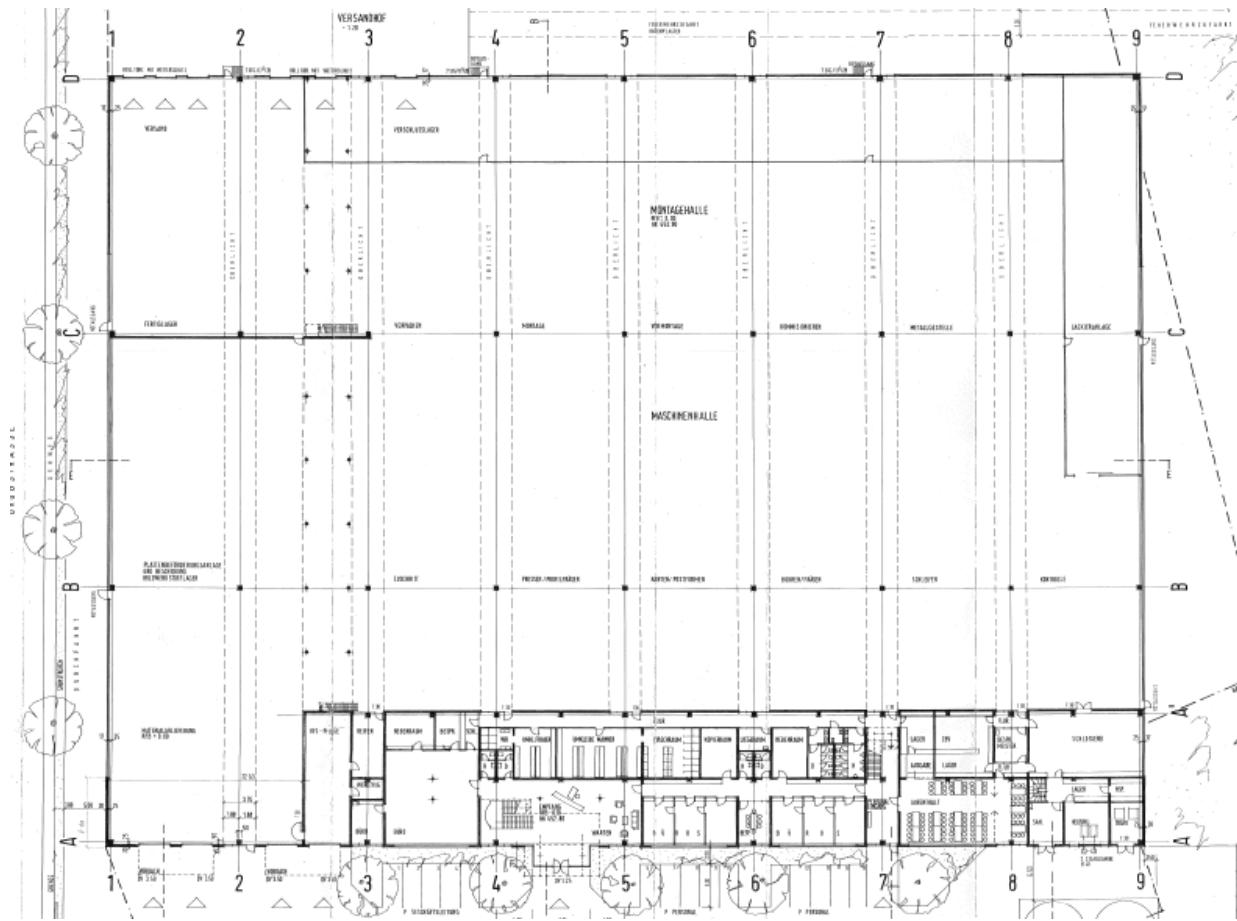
Layout Drawing of the Factory Hall by Schöne + Seeburger
